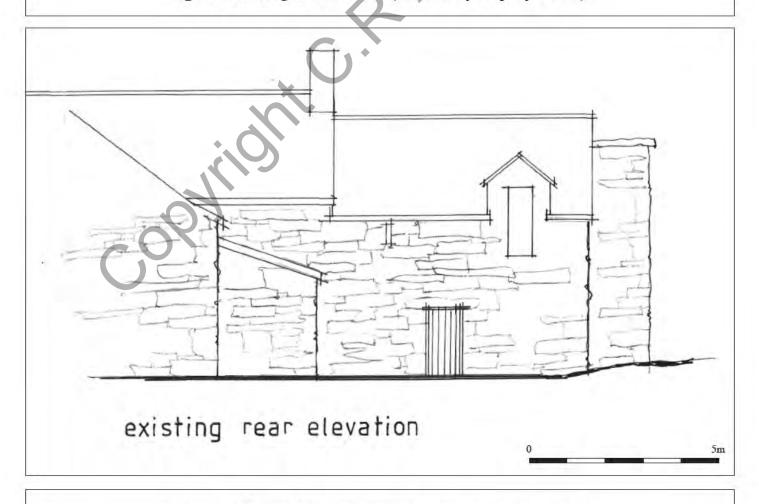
Existing Rear Elevation (Provided by Property Owner)
